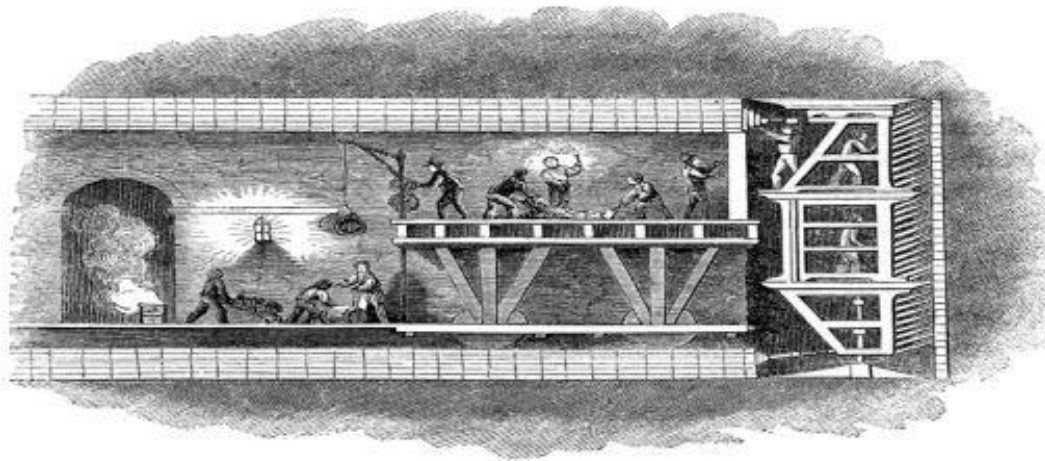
Tunnel construction by using M.S Brunnel's shield
